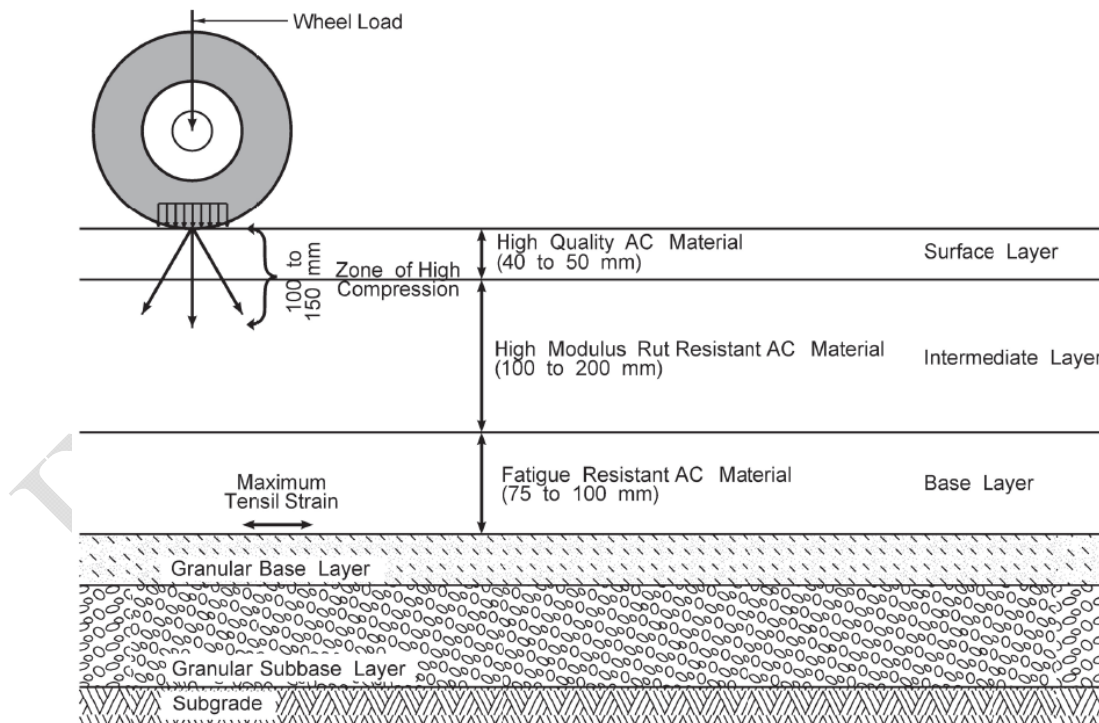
Perpetual Pavement Design Concept (Adopted from APA 2002)
